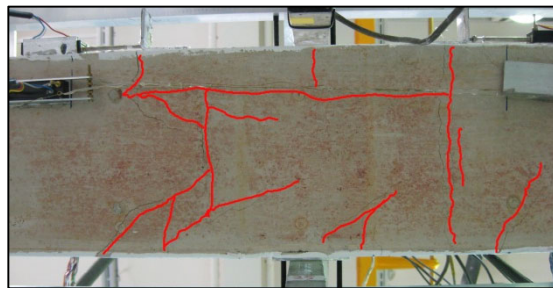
Loss of bond between steel bars and surrounding concrete of specimen (LC27-D16-Ctrl)
